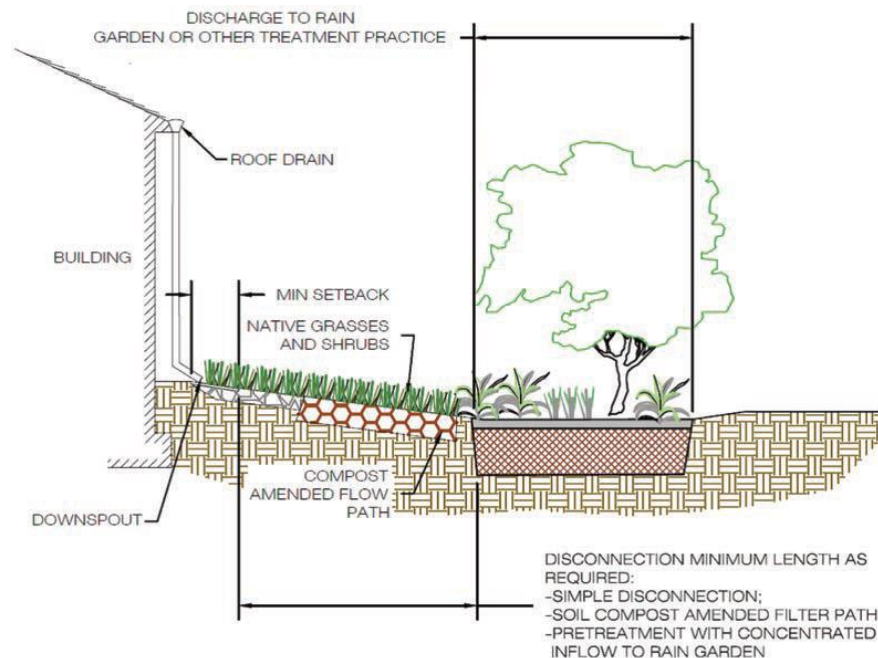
Residential Rooftop Disconnection to downstream raingarden – Bioretention without an underdrain (Source: VADCR).³⁰
